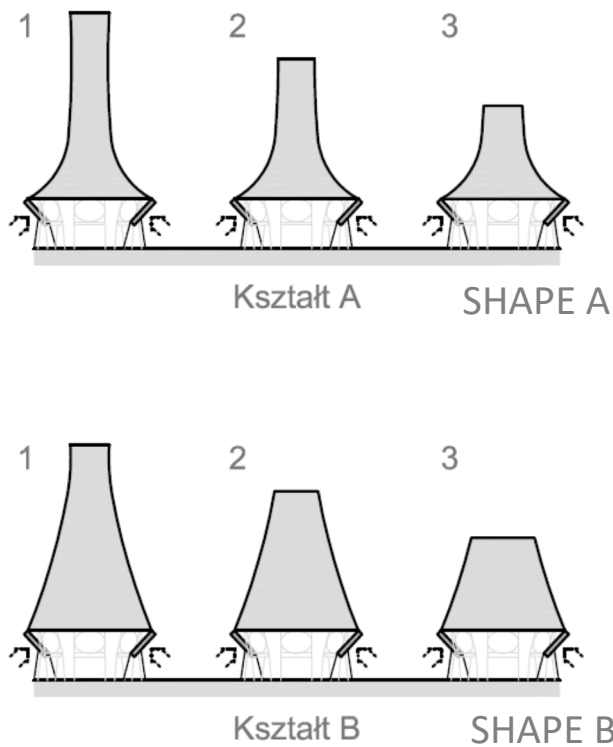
Different variants of chimney shapes A and B: 1 - full chimney 360 mm high, 2 - chimney cut to 3/4 height (270 mm), 3 - chimney cut to half height (180 mm) (Krajewski 2021).
